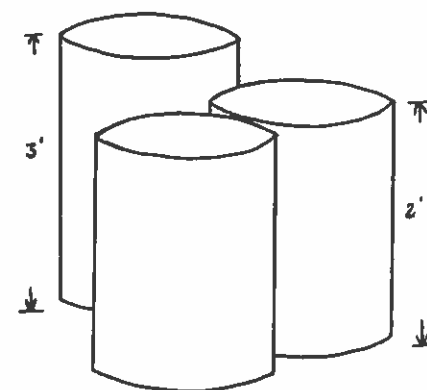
Configuration of clusters of concrete cylinders, used in conjunction with concrete cubes. (Drawing: de Gruchy-Glover collection.)
